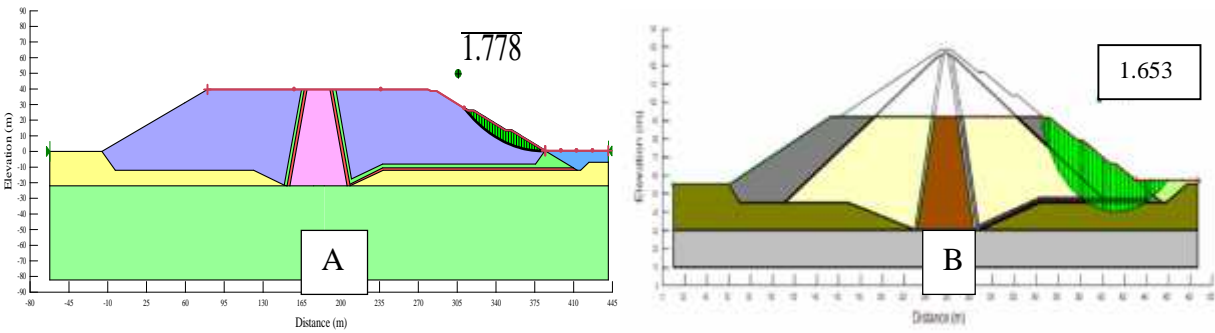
Minimum factor of safety of (A) revised section and (B) original design during first stage construction
